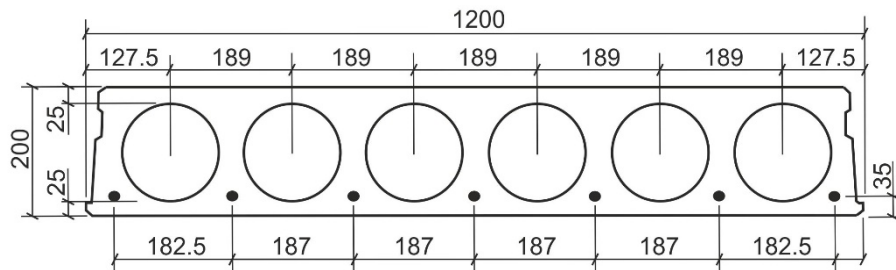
Cross-section dimensions of reinforced prestressed precast hollow core slab (dimensions in mm)
